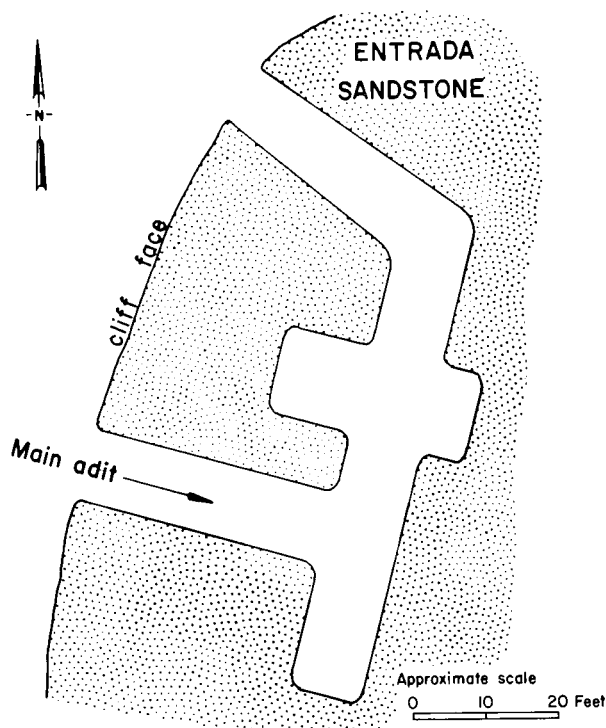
Approximate plan of the Kruckenburg quarry, located south of Glade Park. This underground excavation in the Entrada Sandstone was originally designed for conversion to a homesite.
